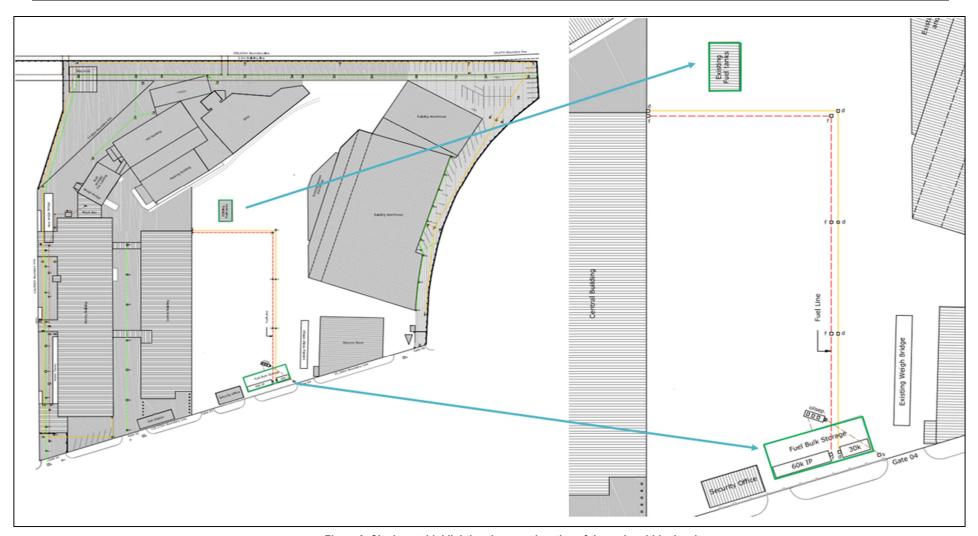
Site layout highlighting the exact location of the tanks within the site.
